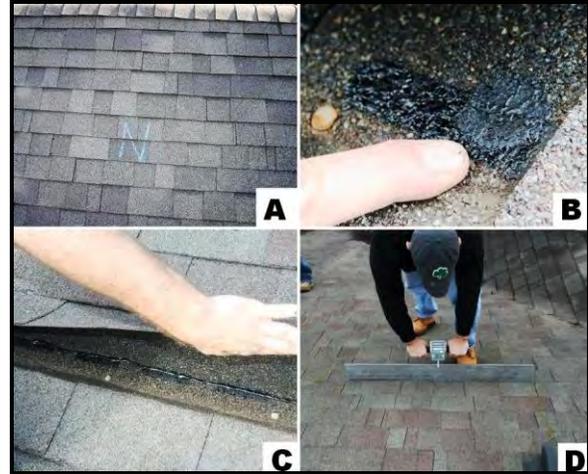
Pull tests on laminated asphalt shingles: a) undamaged shingles, b) dollop of asphalt plastic cement applied under shingle, c) bead of asphalt plastic cement applied under shingle, and d) pull test after 30 days.
